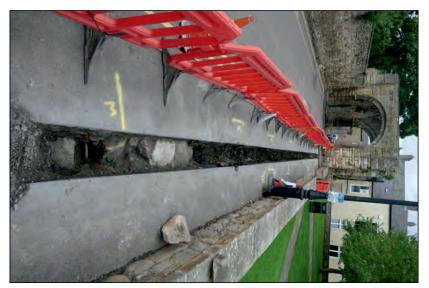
Area C2, view looking NNE at detail of masonry [13].
